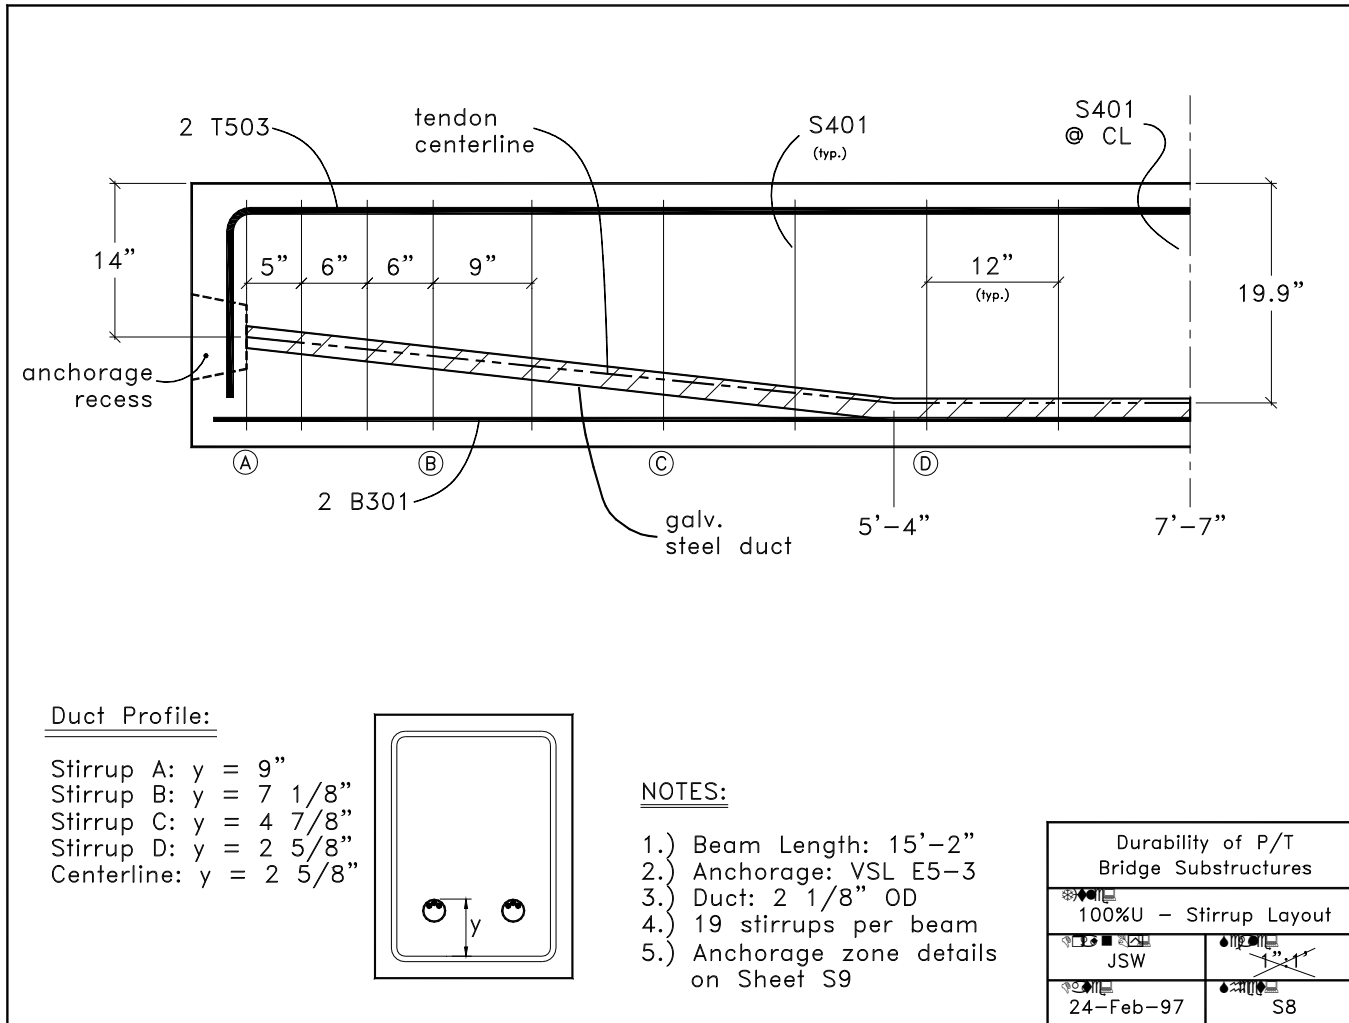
Sheet S8: 100%U Stirrup Layout
